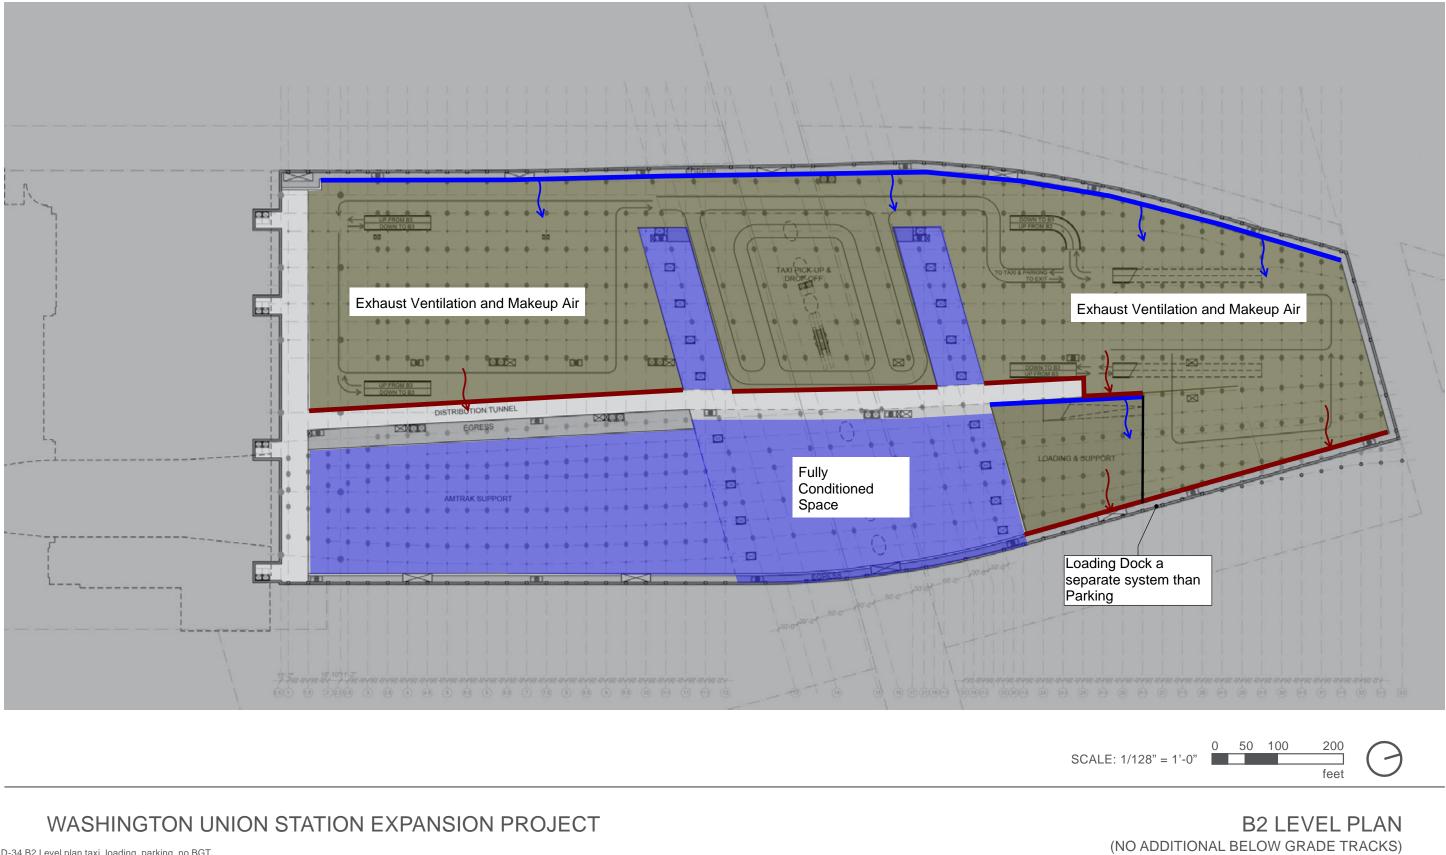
B2 Level plan taxi, loading, parking, no BGT
